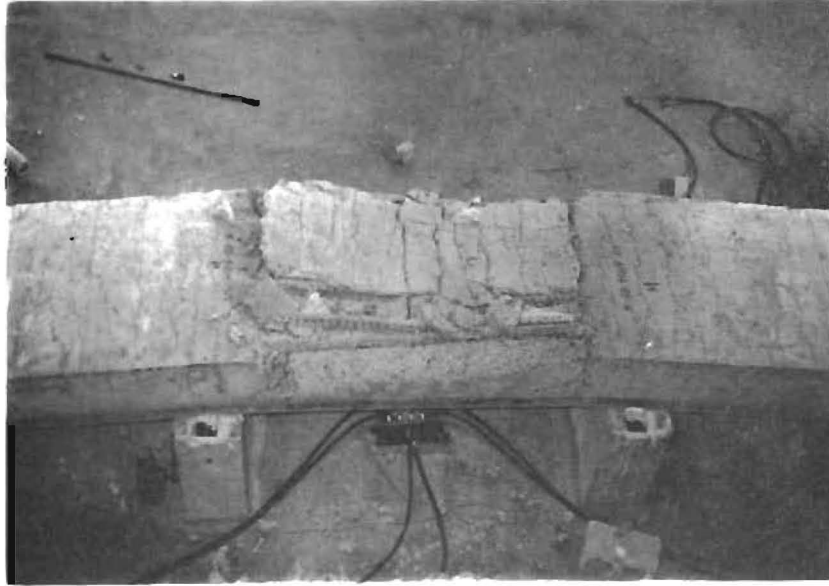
Tension face of 14-60-4/2/4-5/5 after failure
